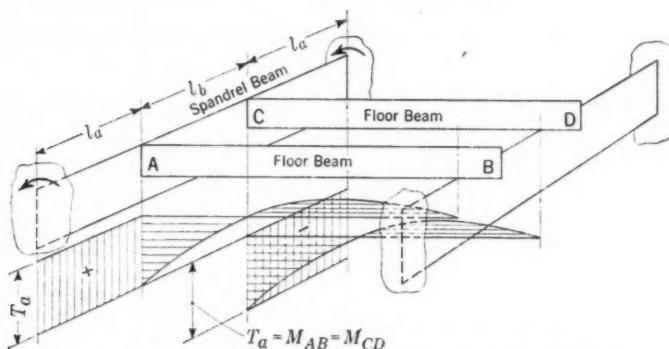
TORSION DISTRIBUTION FOR TWO SYMMETRICAL FLOOR BEAMS
